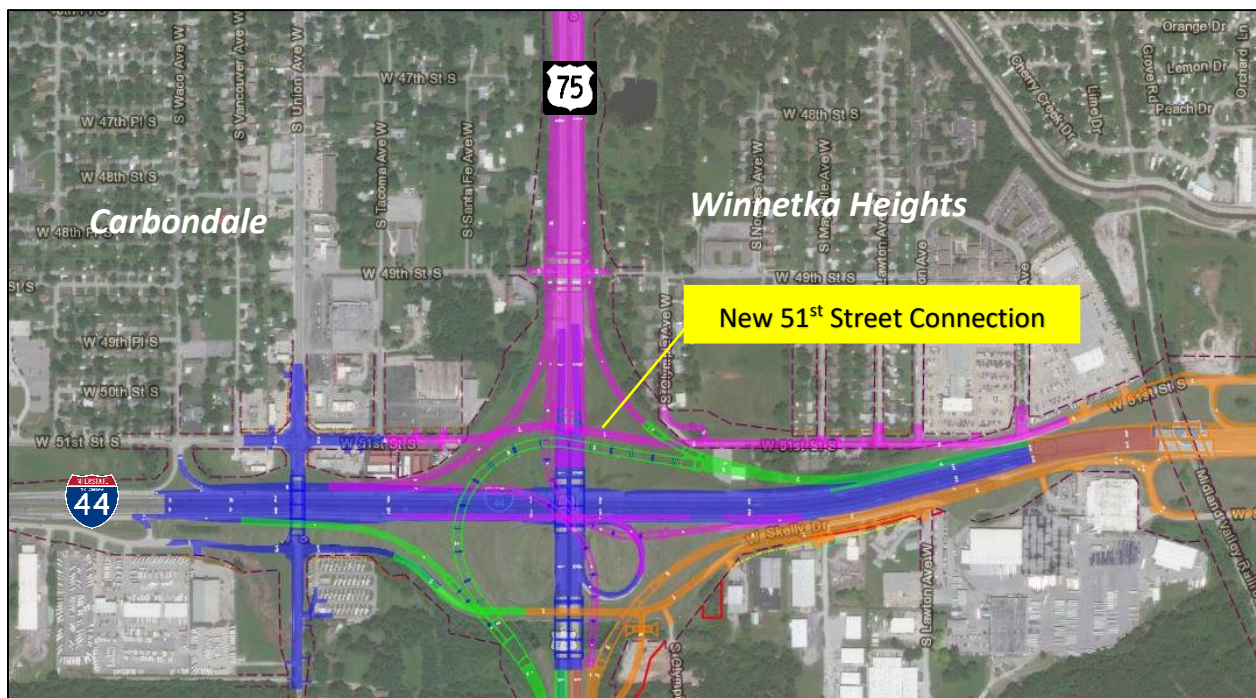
New 51st Street Connection between Carbondale and Winnetka Heights
